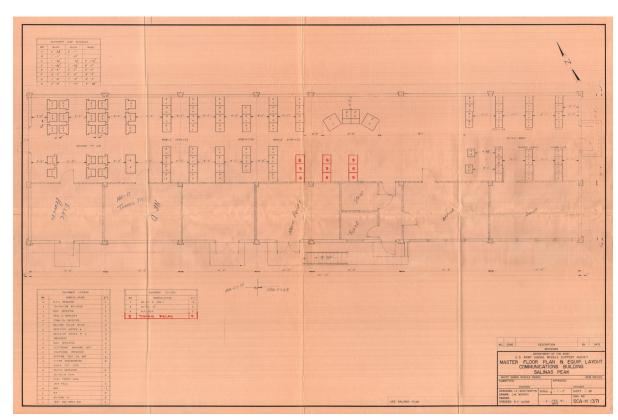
Floor plan of Property 32272 Communications Building, from drawing SCA-H1374 drawing dated February 2, 1961.
